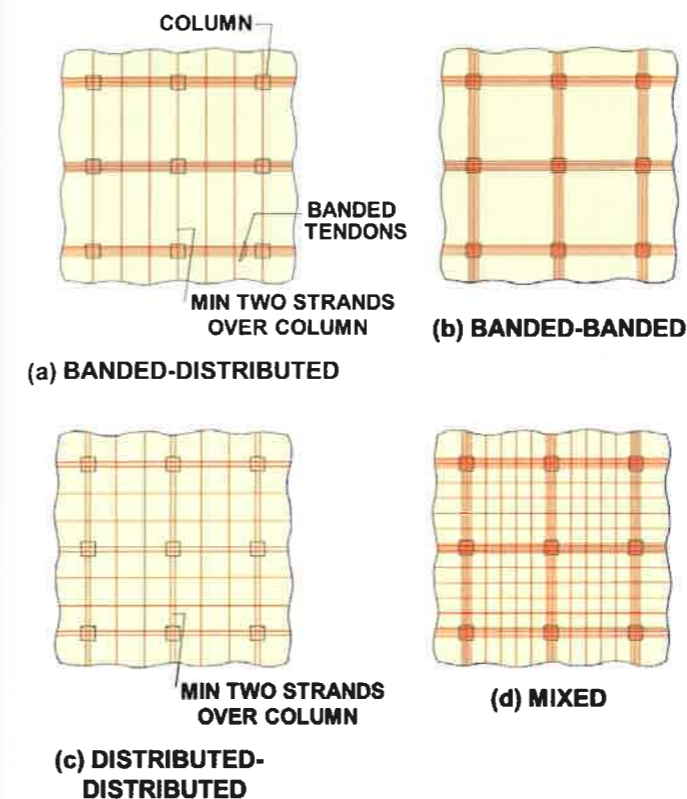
A-1 Alternatives of Tendon Arrangement (P547)
